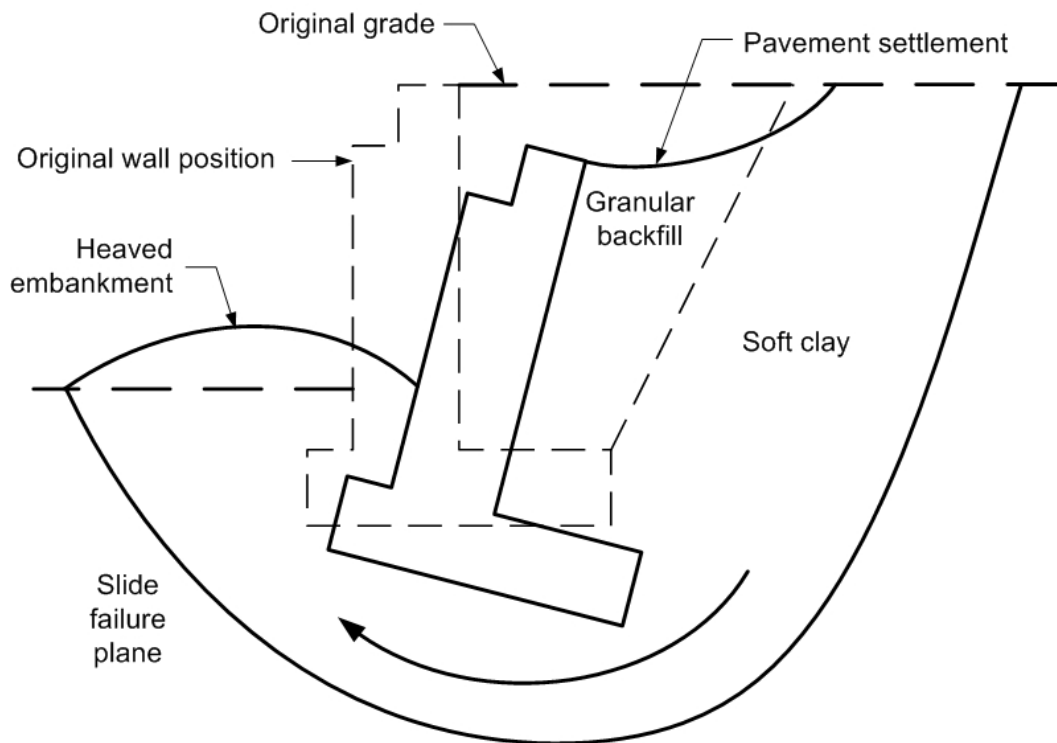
Lateral and Rotational Abutment Movement due to Slope Failure
